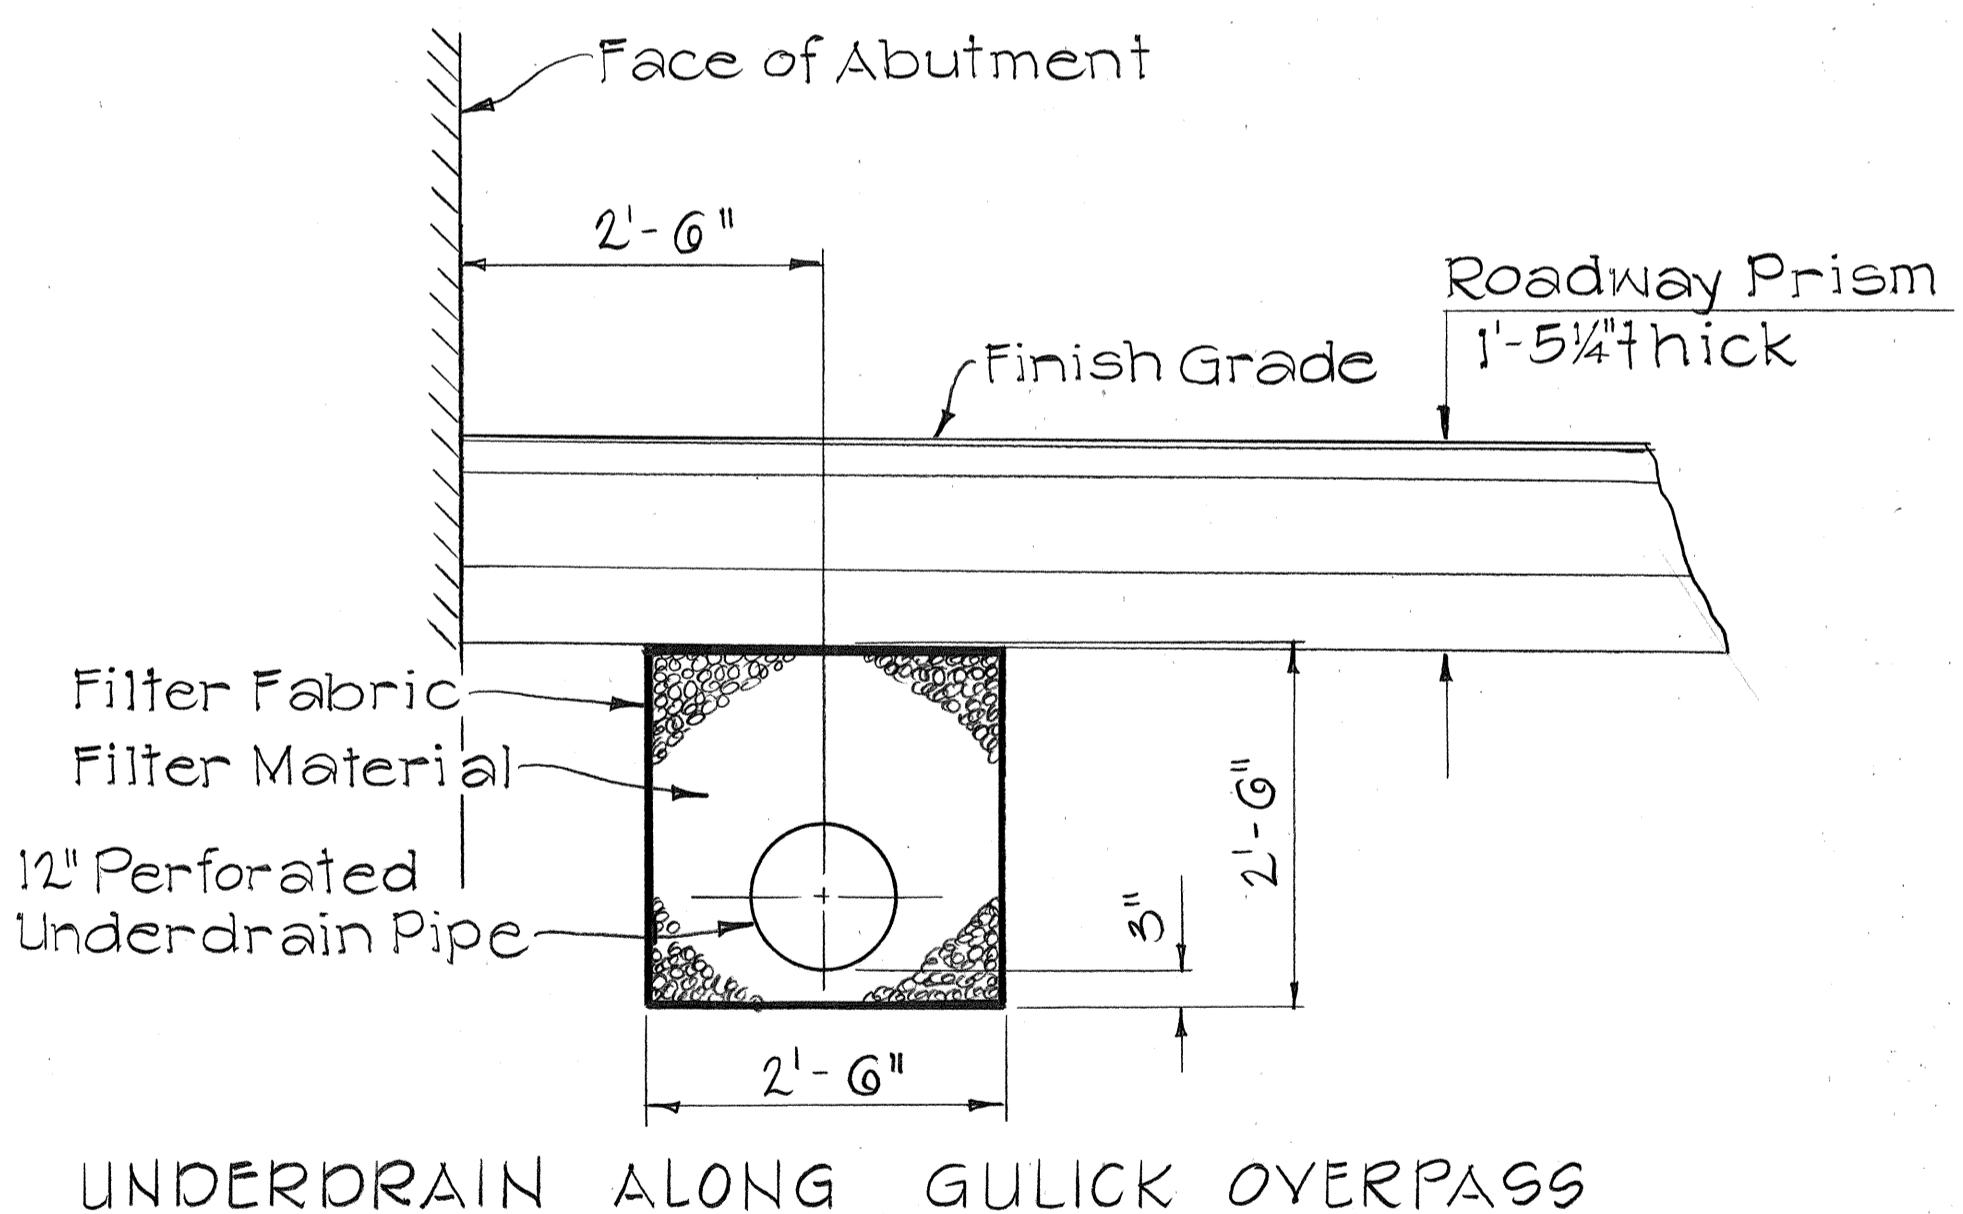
#### DETAIL FOR UNDERDRAIN PIPE SYSTEM
